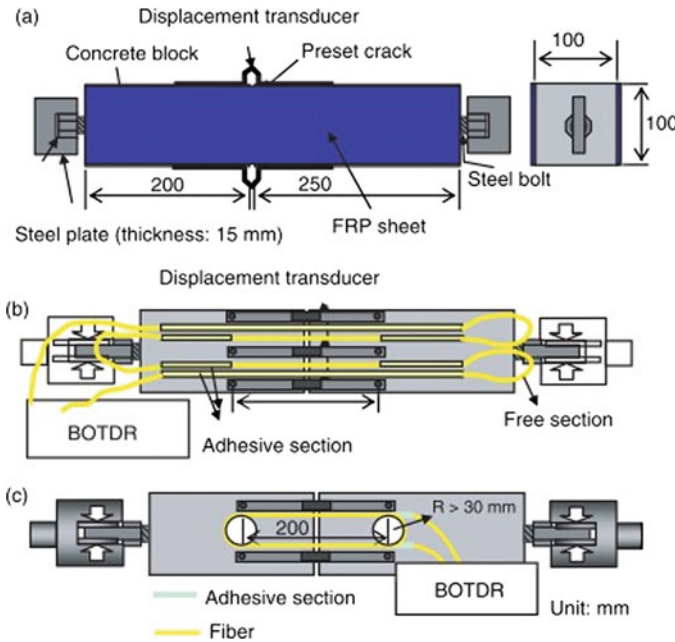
Experiment specimen a side view, b plan view (point fixation and overall bonding), c plan view (loop installation) [11]
